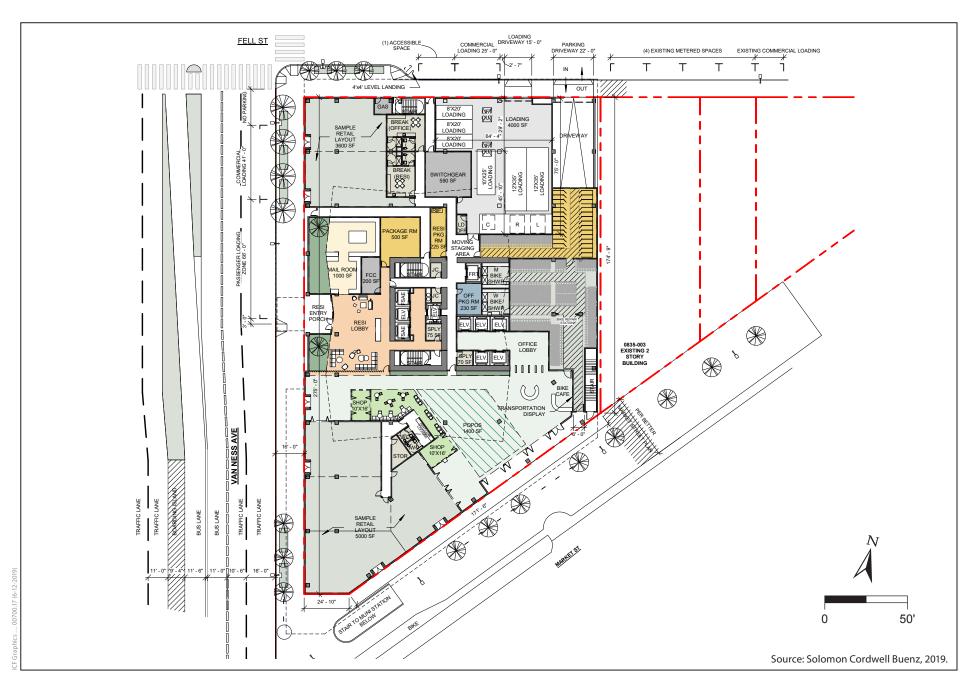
30 Van Ness Avenue Project – Proposed Ground Floor Plan
